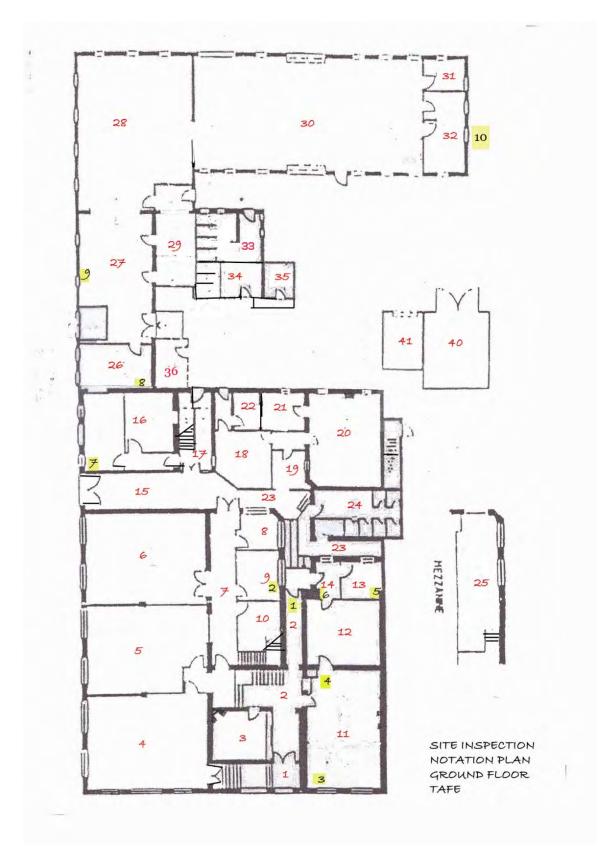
Part 8: TAFE ground floor plan - site inspection notation
